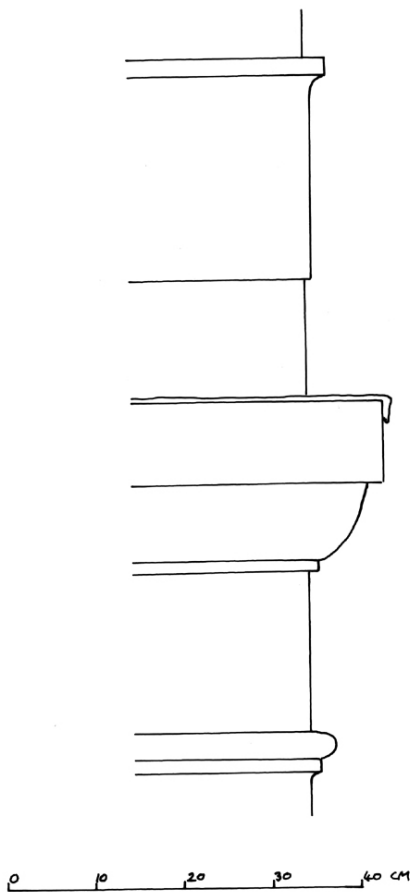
The Orangery wall, capital moulding on pilaster 1.
